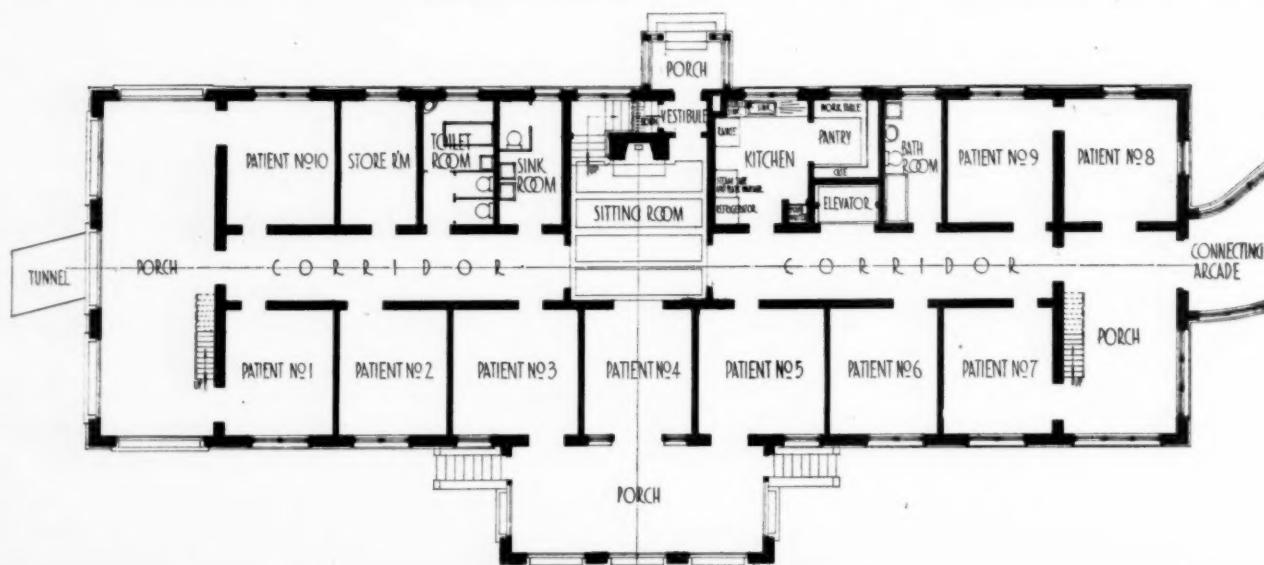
Nopeming Hospital for Tuberculosis. Infirmary building. First floor plan.
